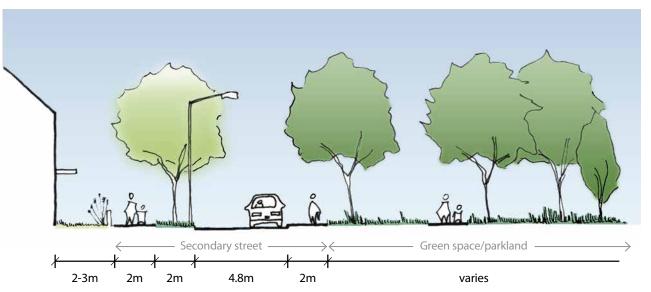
C-C – typical secondary street cross section (refer to Fig. 18 for section location)
